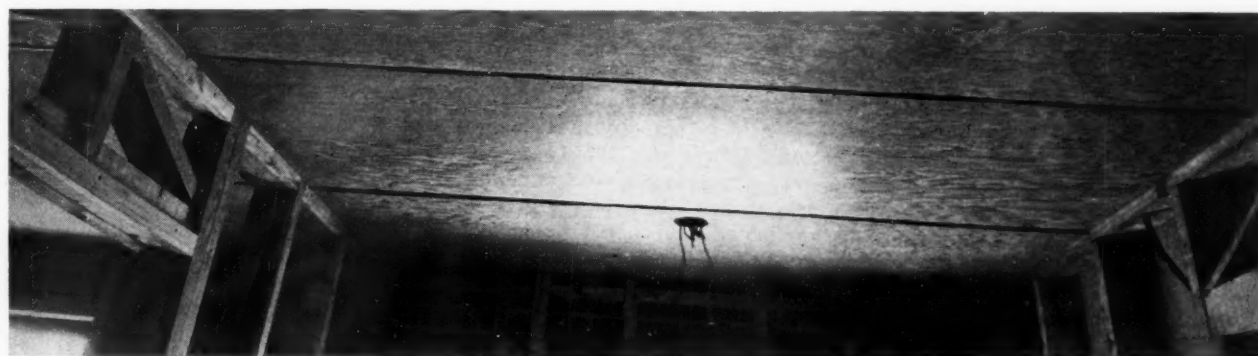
PLYWOOD INSTALLED AS A FLUSH CEILING
